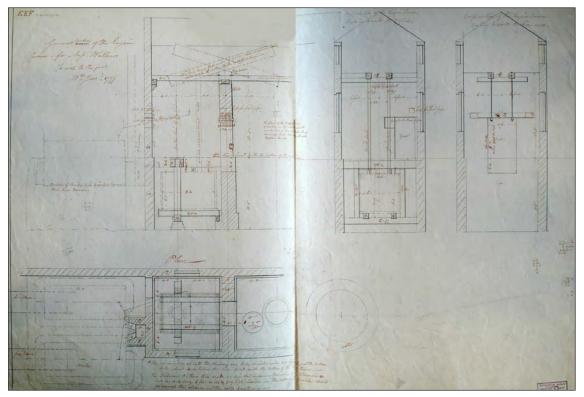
'Plan of new furnace etc. for Messrs Walker'. 15 August 1798. Note the close arrangement of blowing engine and boiler house suited to a single furnace. This arrangement matches correspondence about Walker & Co's requirements mentioned in the history section above. Reproduced with the permission of the Library of Birmingham, MS 3147/5/688.
